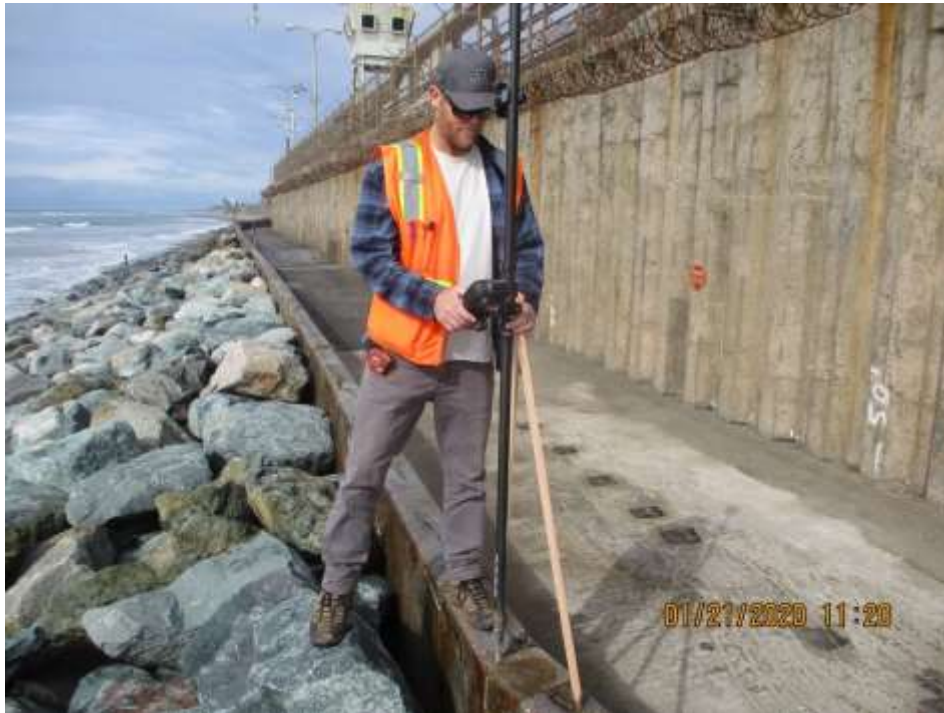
Benchmark BM07, created on 21 January 2020, is located on the NE corner of a concrete structure located south of the San Onofre State Beach parking lot and north of transect N0500.
